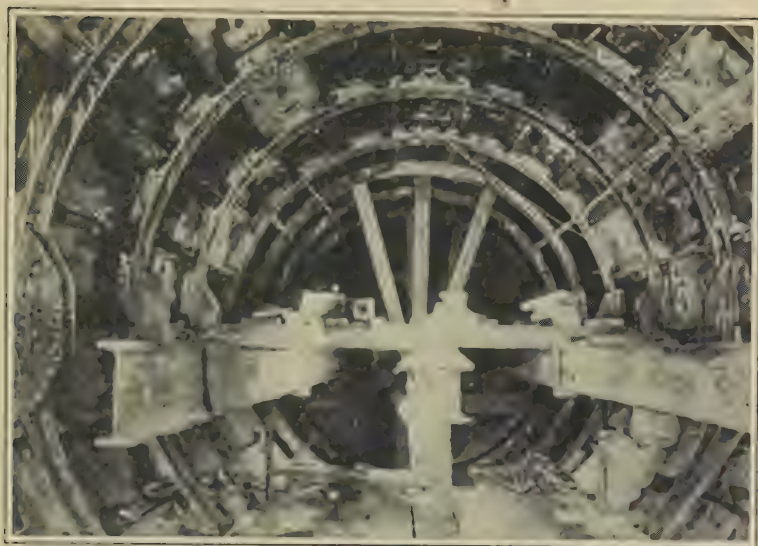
ERECTING FORMS AT TUNNEL HEADING.
